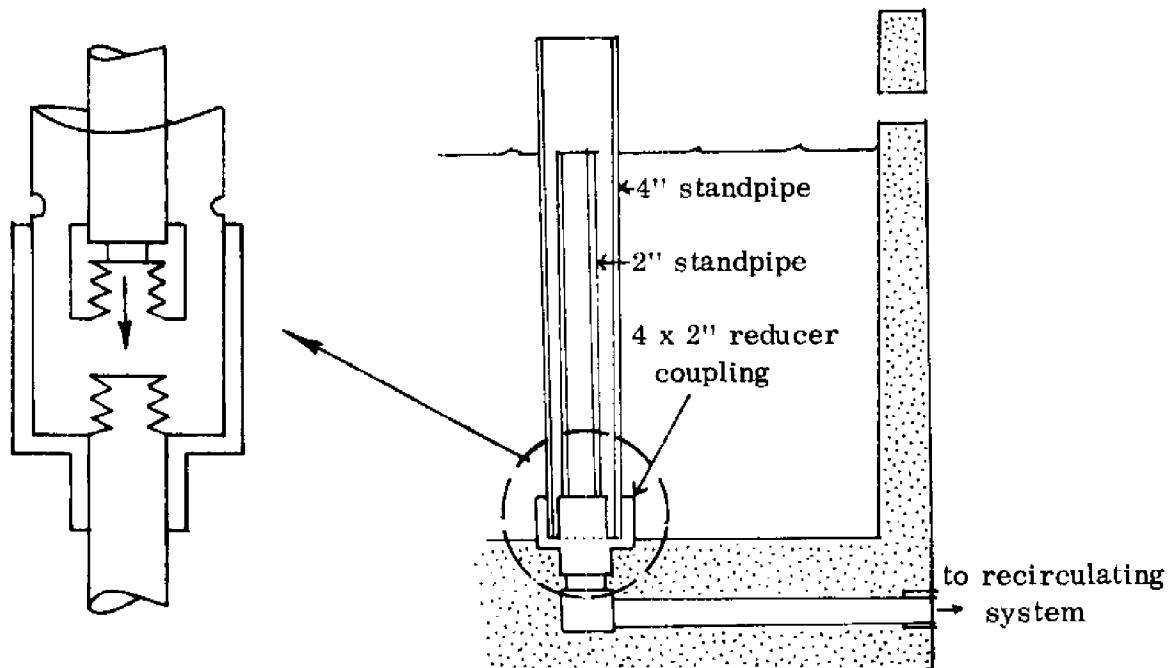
Holding tank drain assembly schematic and reducer coupling detail.
